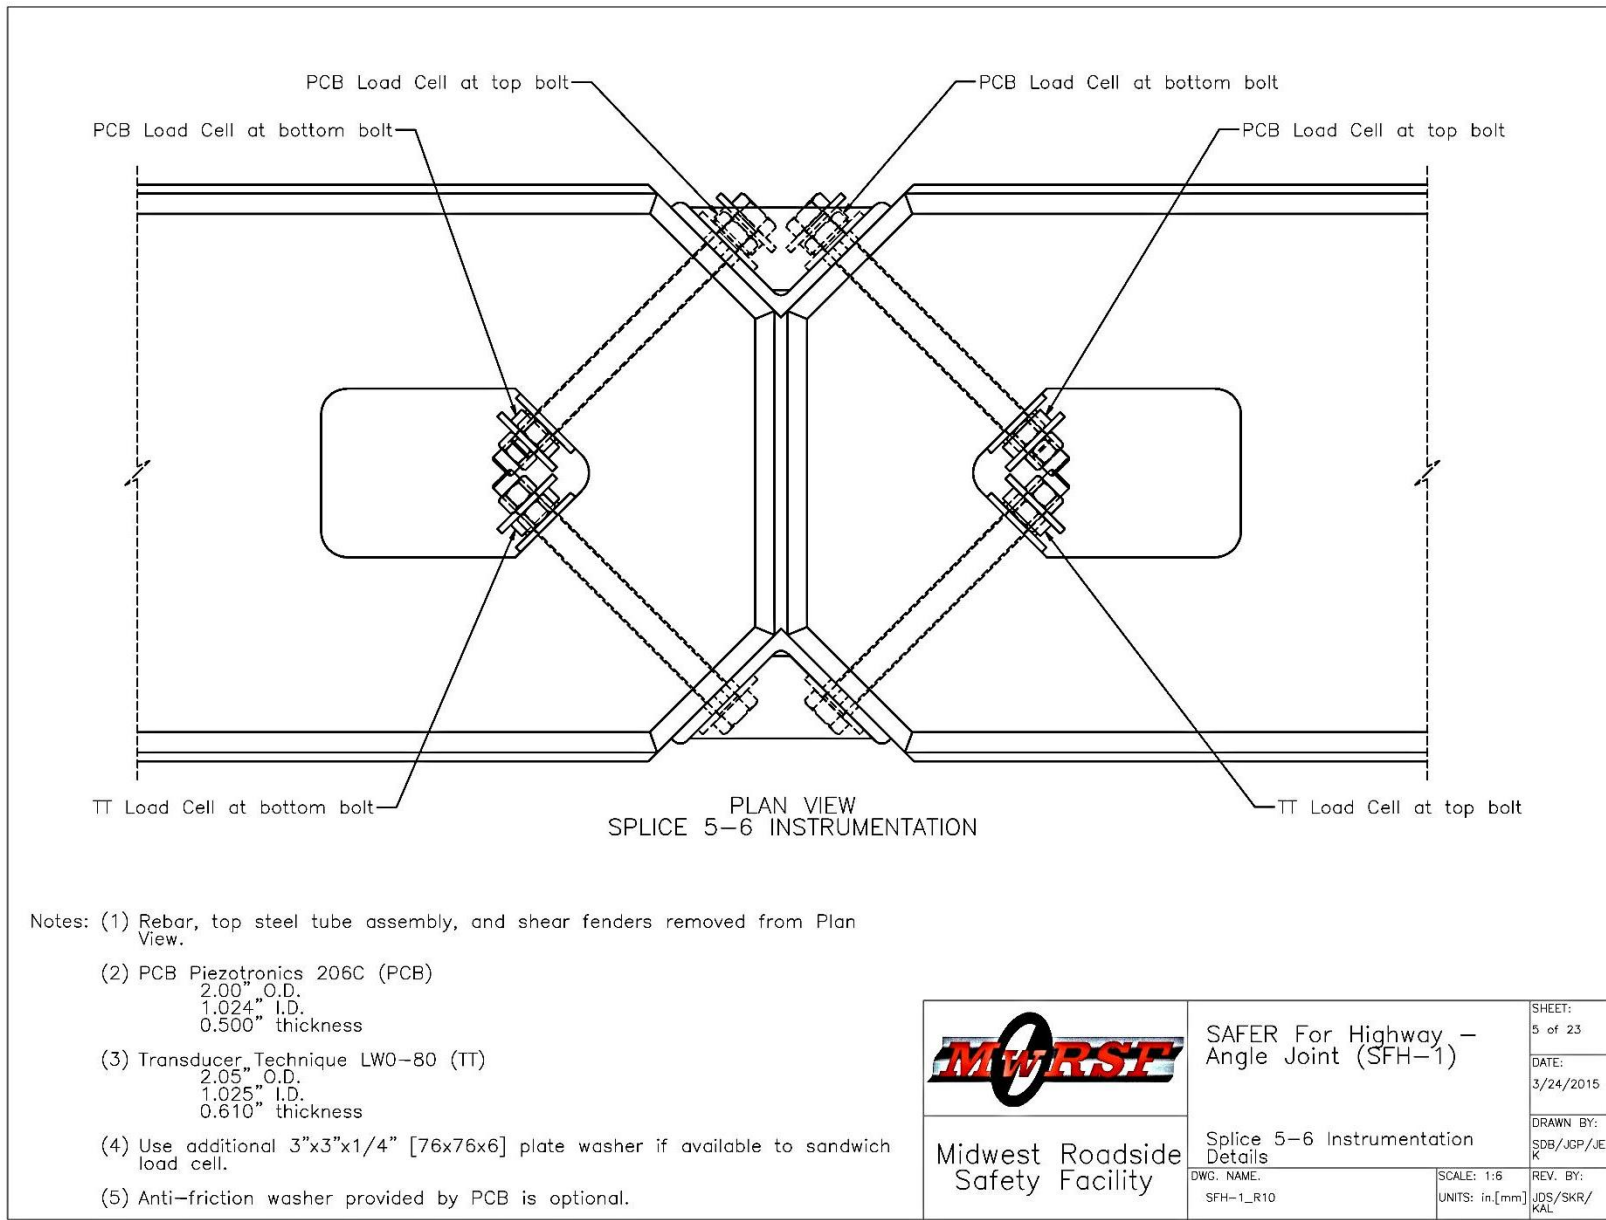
Splice 5-6 Instrumentation Details, Test No. SFH-1
